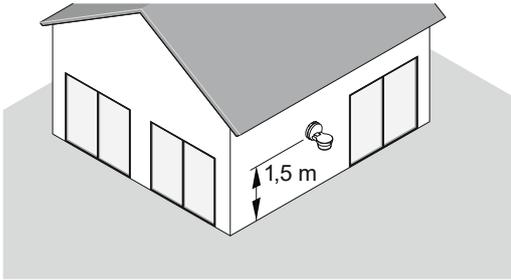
Wall mounting on free-standing one- family house 6851/22S-xxx
